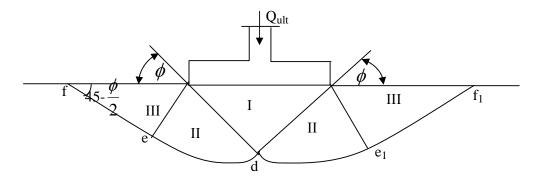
Failure zones below a footing with rough base.
